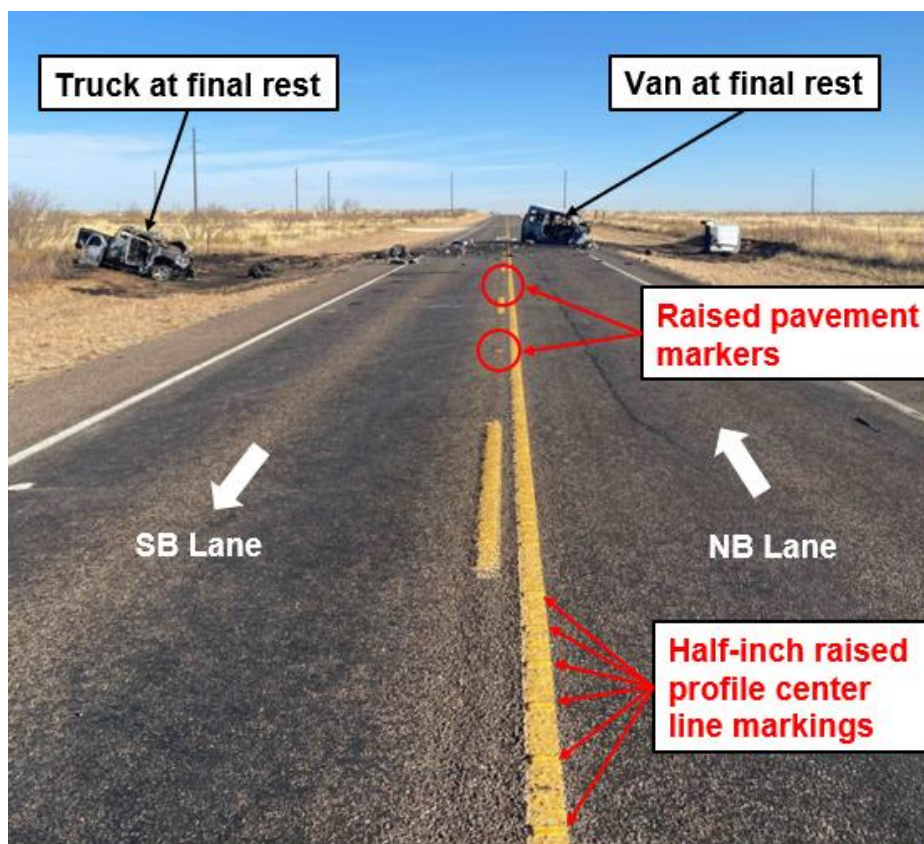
Location of the half-inch raised profile center line markings and raised pavement markers in the vicinity of the crash looking to the north (Source: TxDOT revised).
